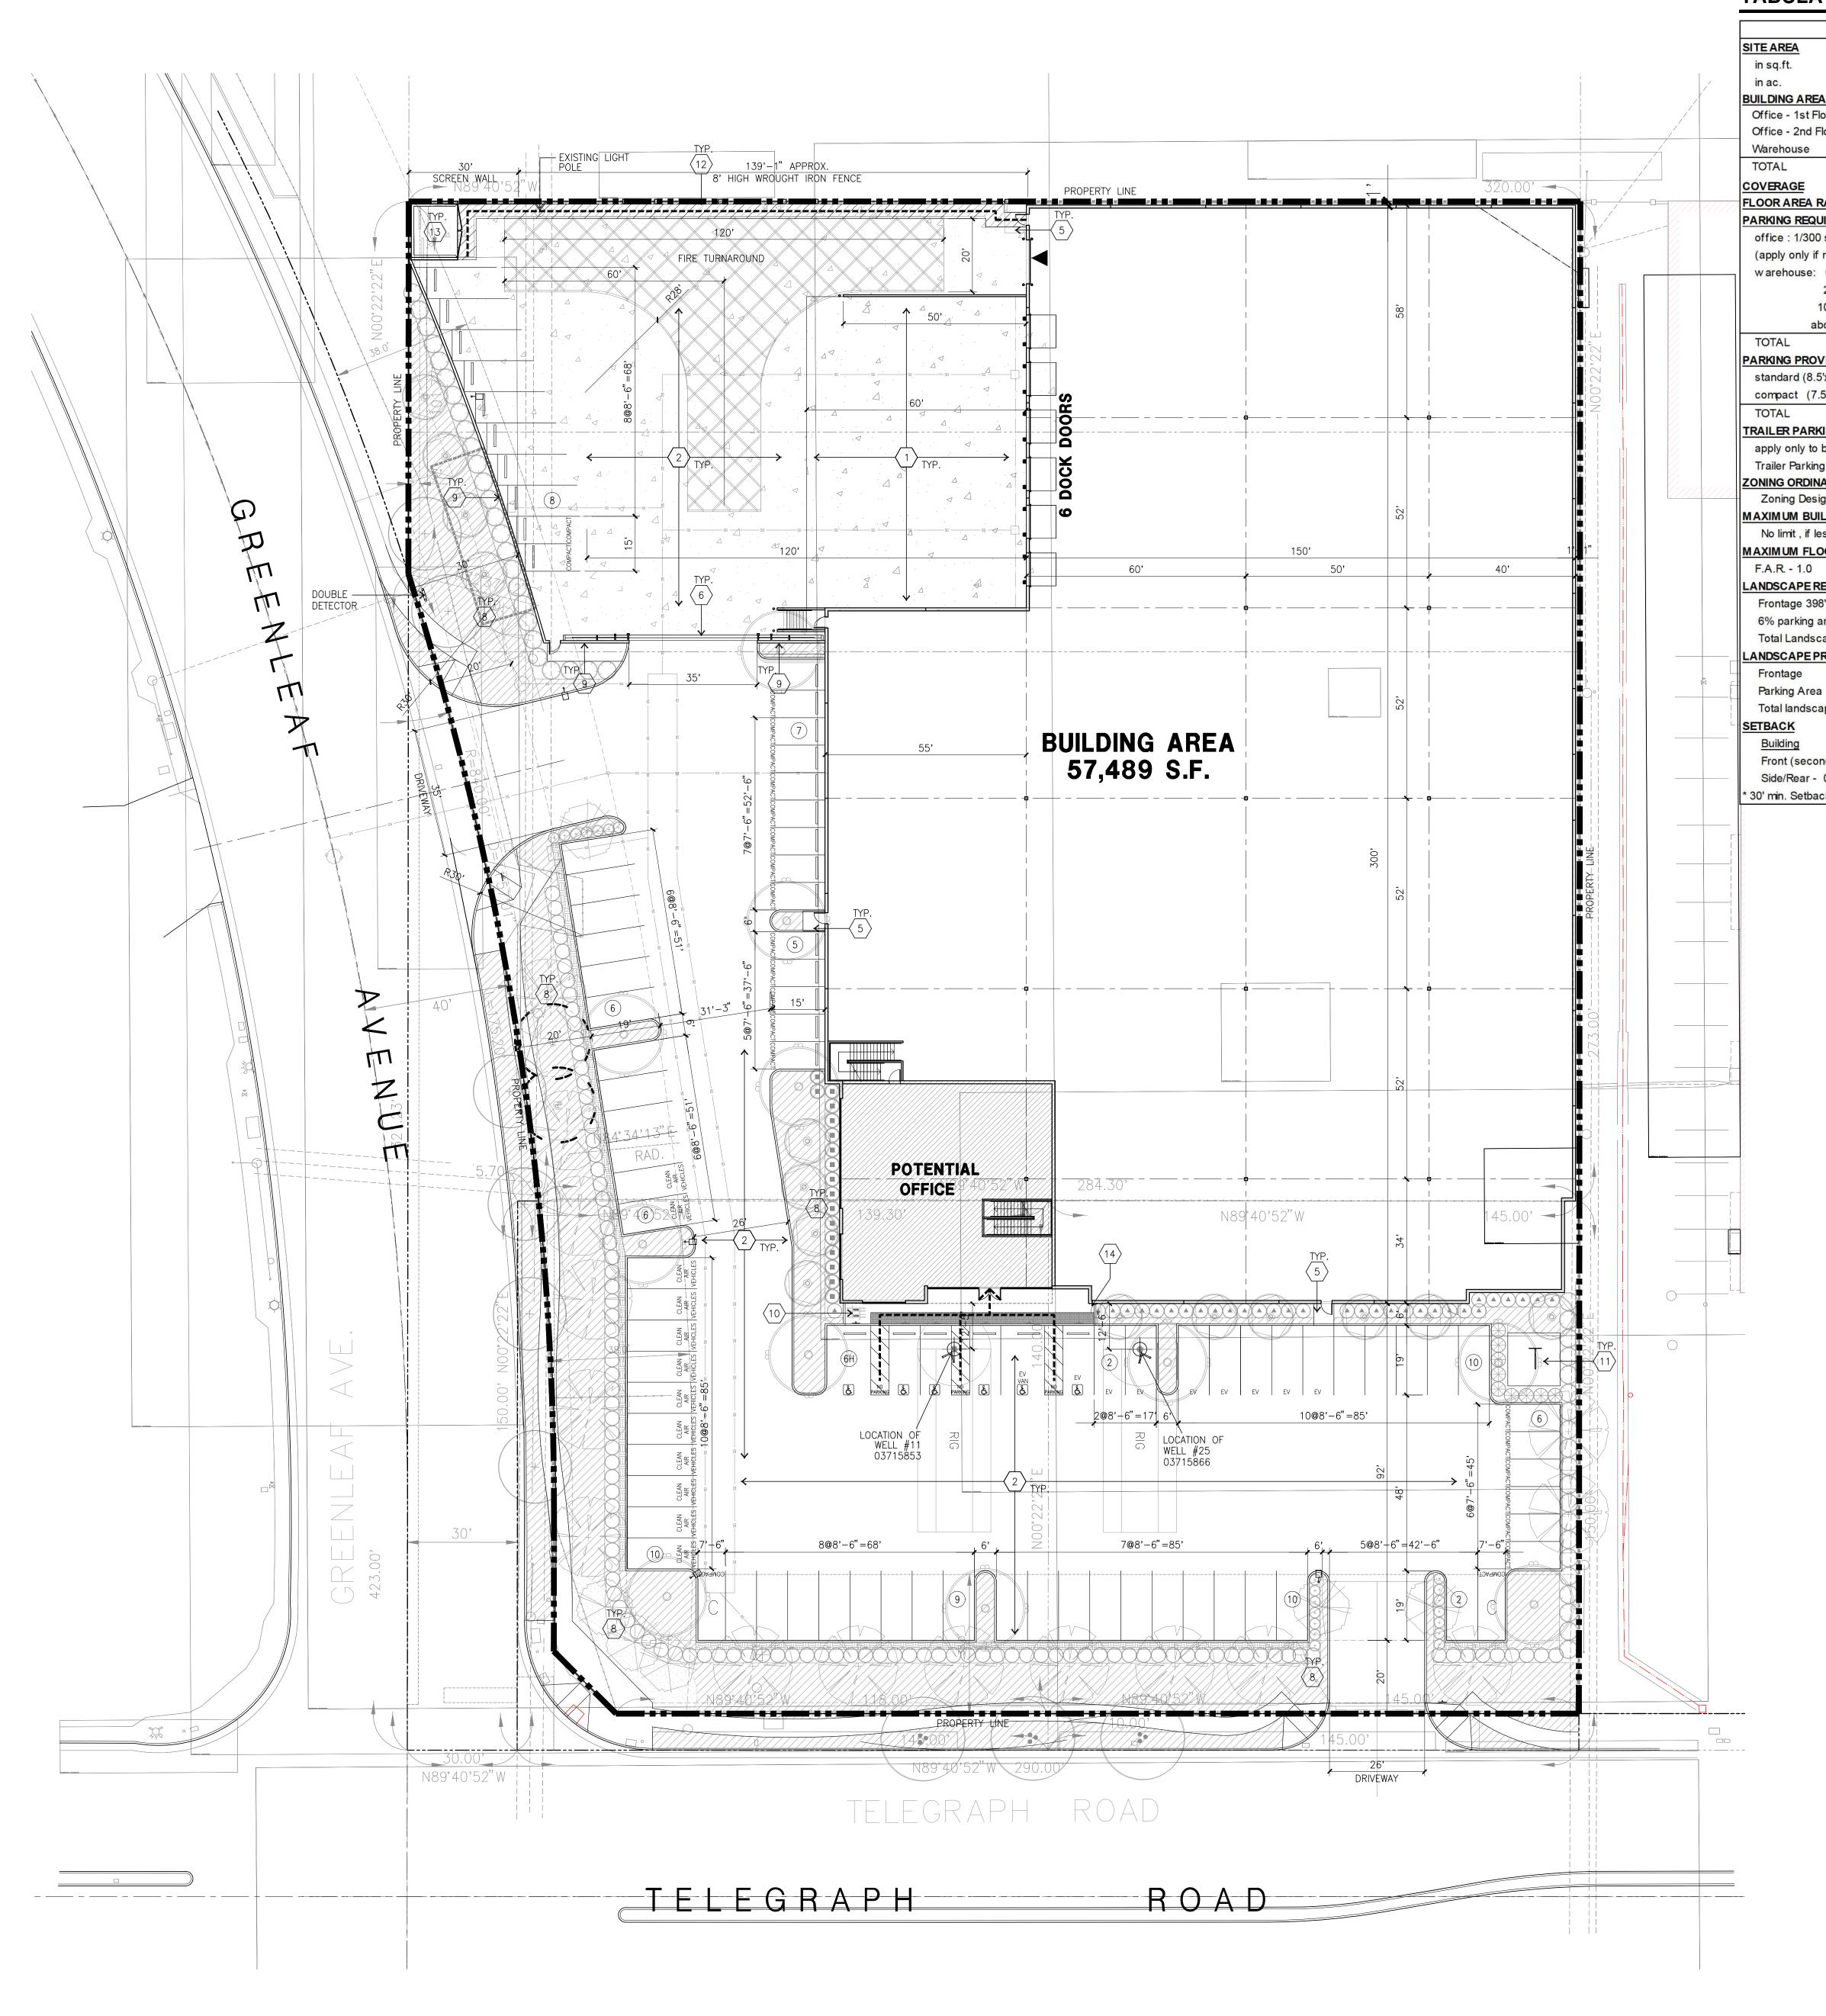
EXHIBIT "C" SITE PLAN Lot Line Adjustment LLA 2023-01
